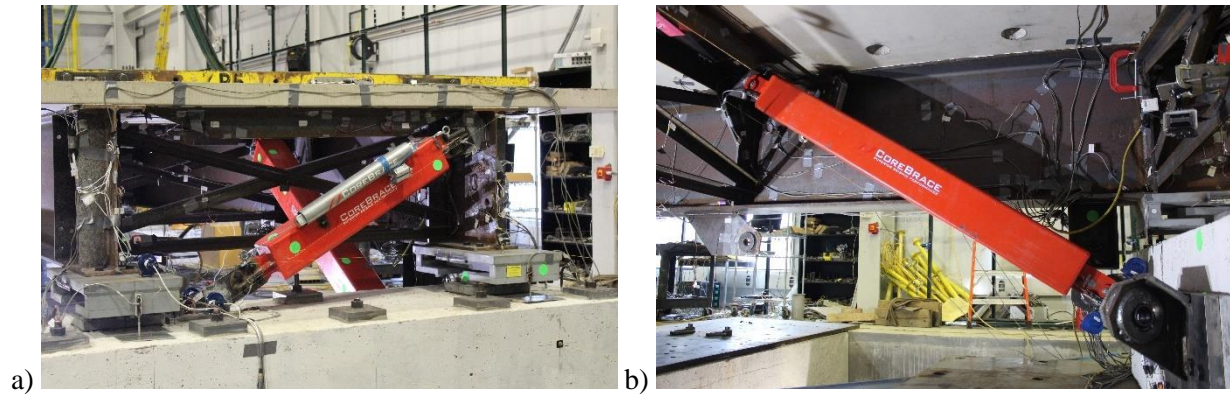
Specimen with BRBs and instrumentation for Configuration II: a) transverse BRB in the west end, b) longitudinal BRB
